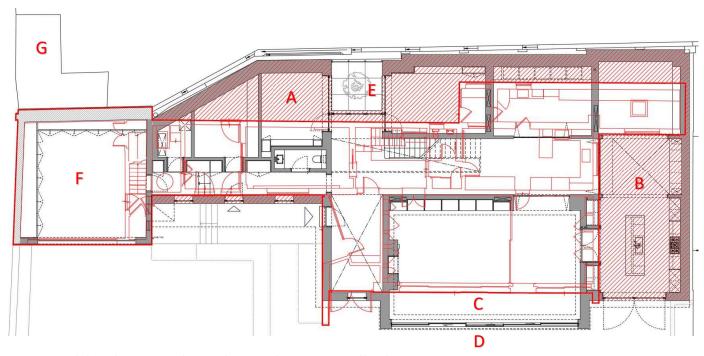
Ground Floor plan: existing plan in red, proposed new areas in red hatch
